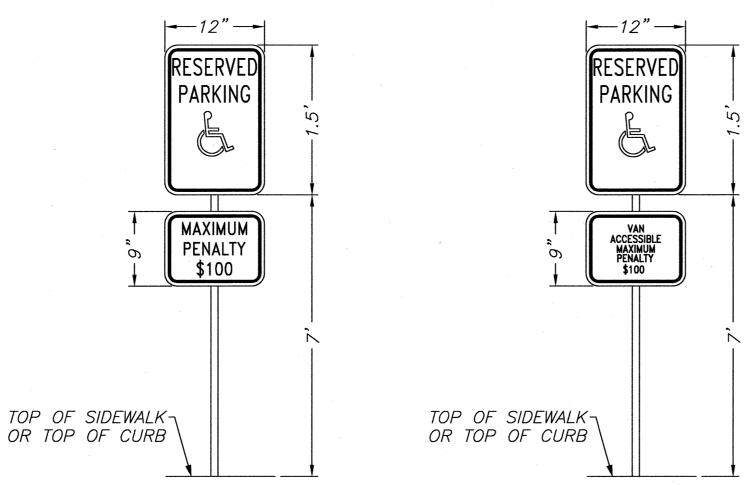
DETAIL "F" TYPICAL HANDICAP PARKING SIGN
